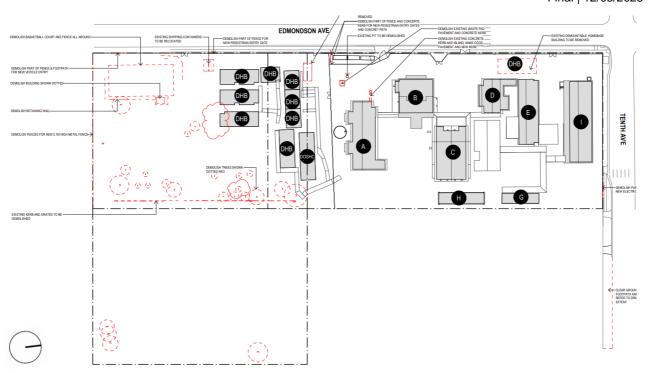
Site Demolition Plan (Source: Pedavoli Architects)
